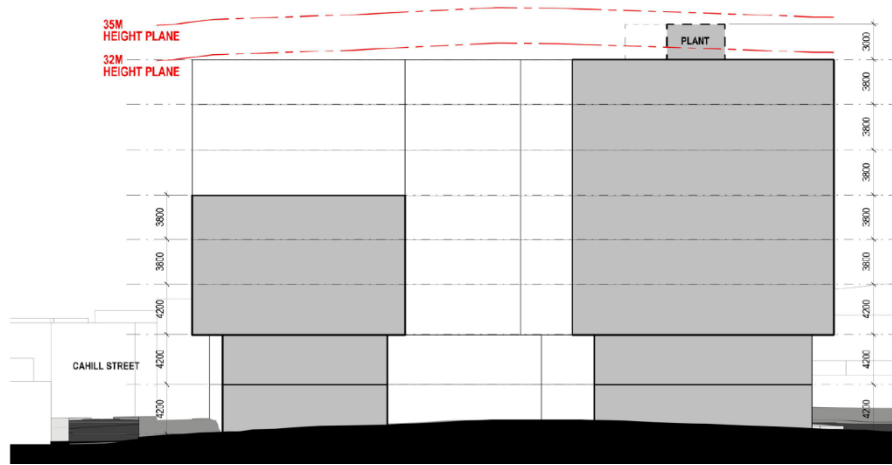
DesignInc's indicative building section showing the potential transition of height towards Cahill Street and proposed new setback along Pymont Bridge Road and Cahill Street. The section also indicates refinement required to the proposed HOB control to allow plant/services within the building height.
